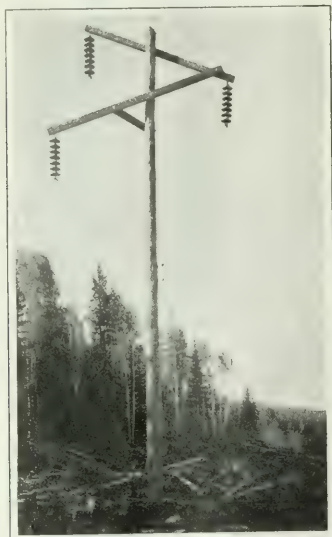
Standard wishbone construction, Nipigon transmission line, looking north about three miles to power house (ground wire not placed).
